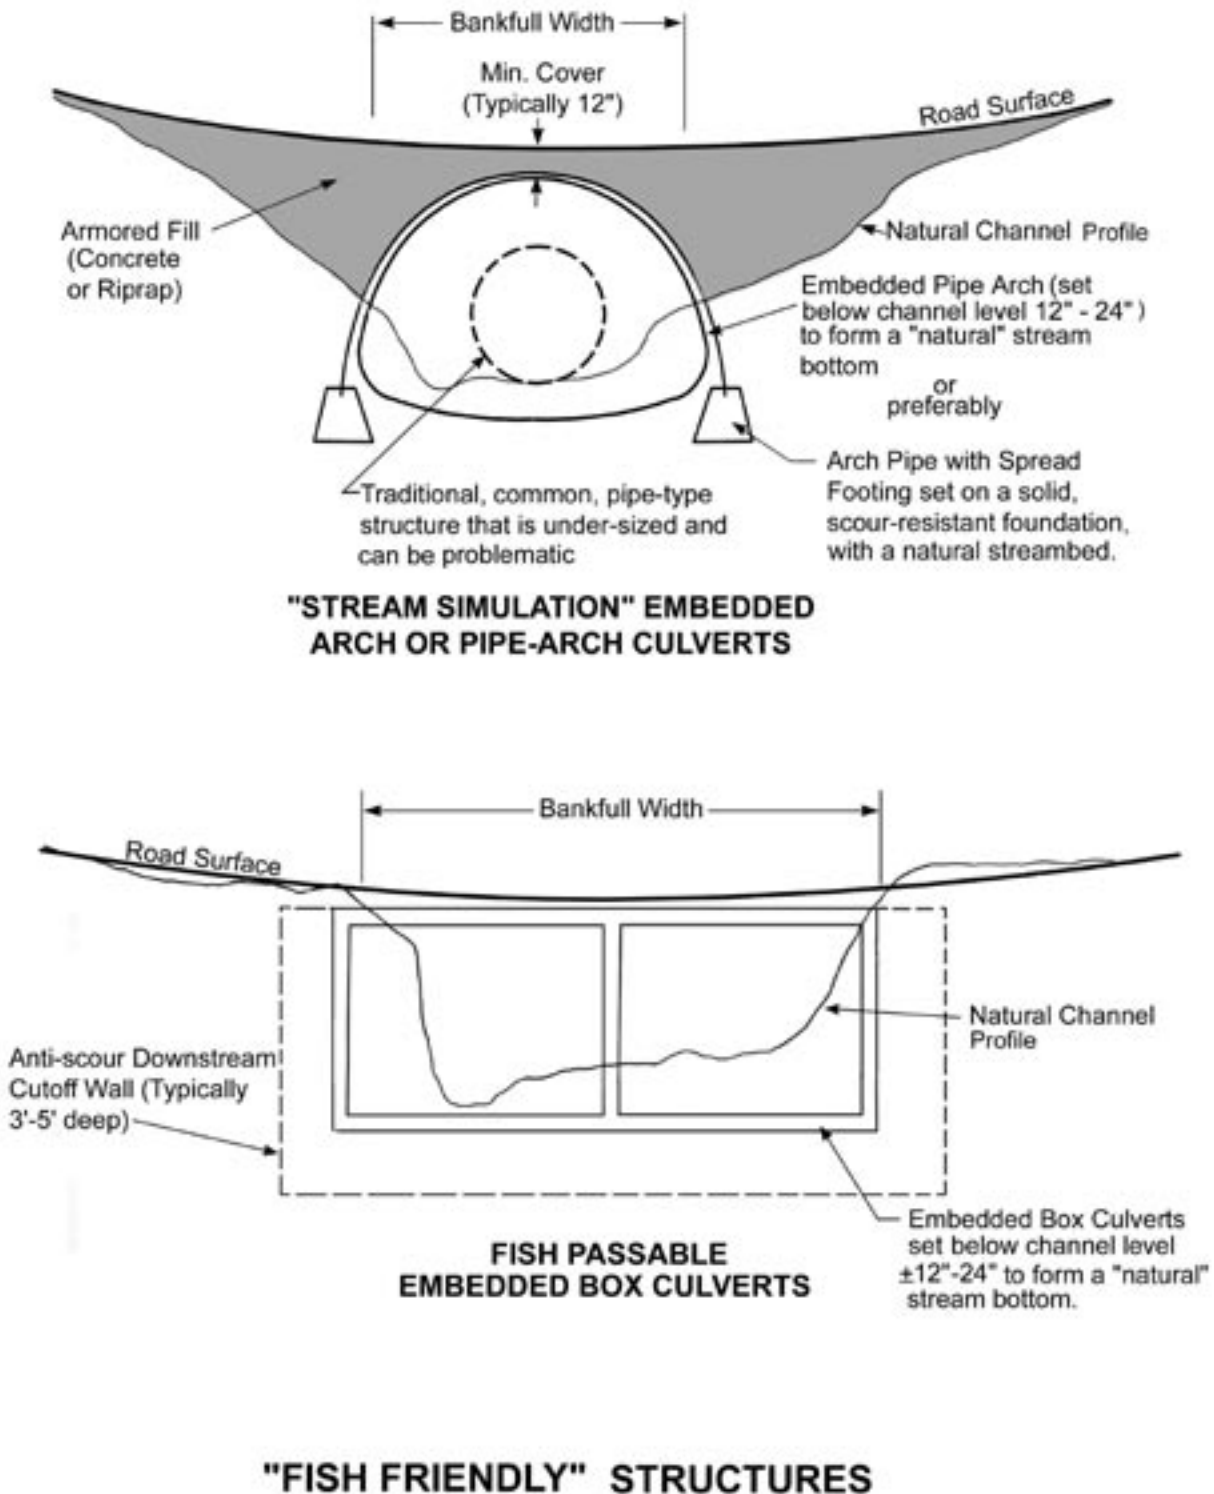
Low-water crossings that provide passage for fish and other aquatic species. The embedded culverts would have a layer of streambed material at least 1- to 2-foot thick covering the culvert floor.
